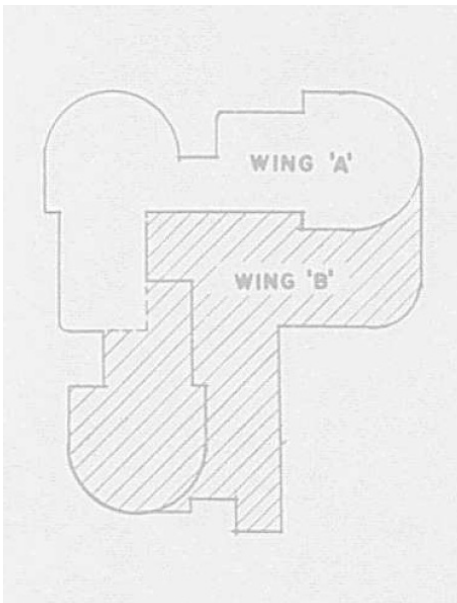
I.S. 131 Floor Plans, Source: Architectural Plans, NYC Municipal Archives
